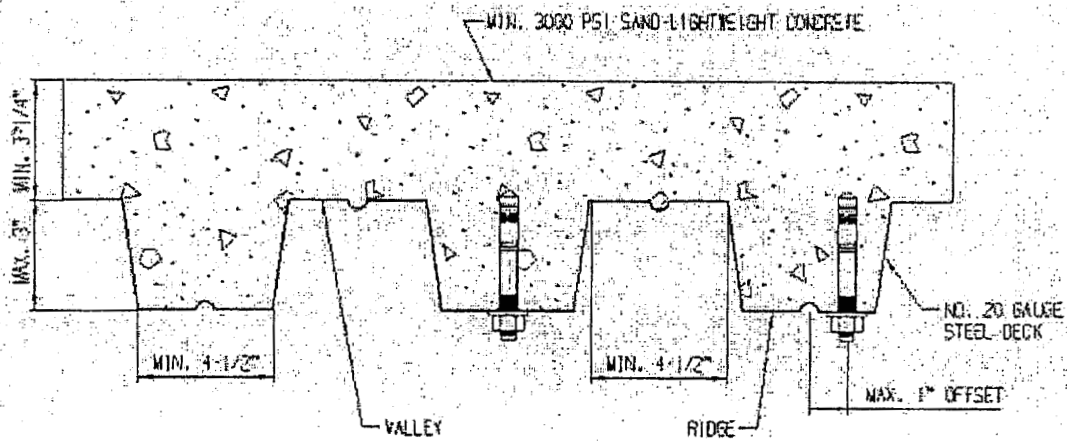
PROFILE OF STRUCTURAL-LIGHTWEIGHT CONCRETE OVER METAL DECK
